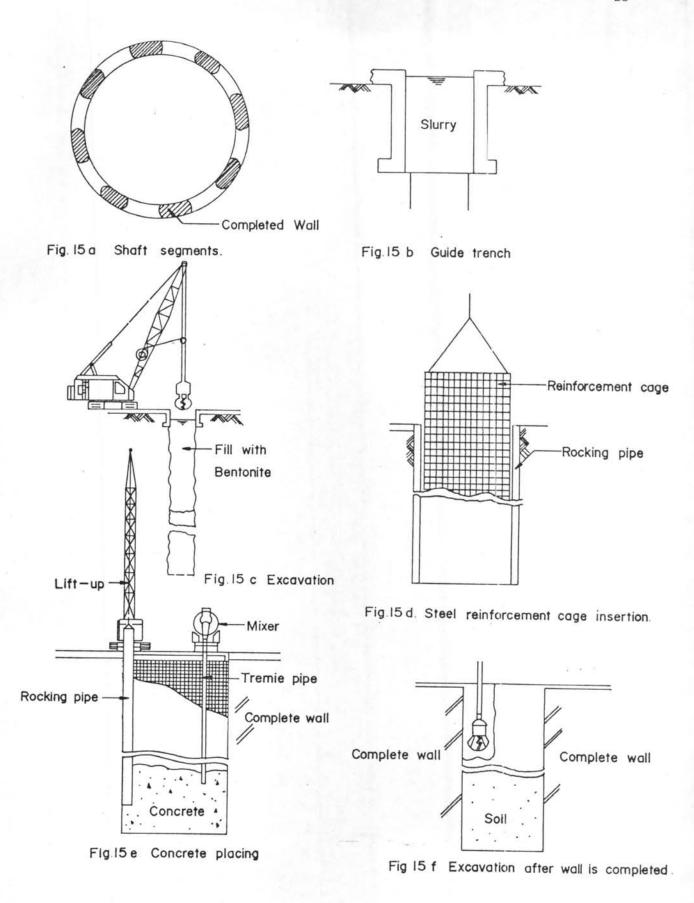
Shaft construction by OWS - SOLETANCHE method.
